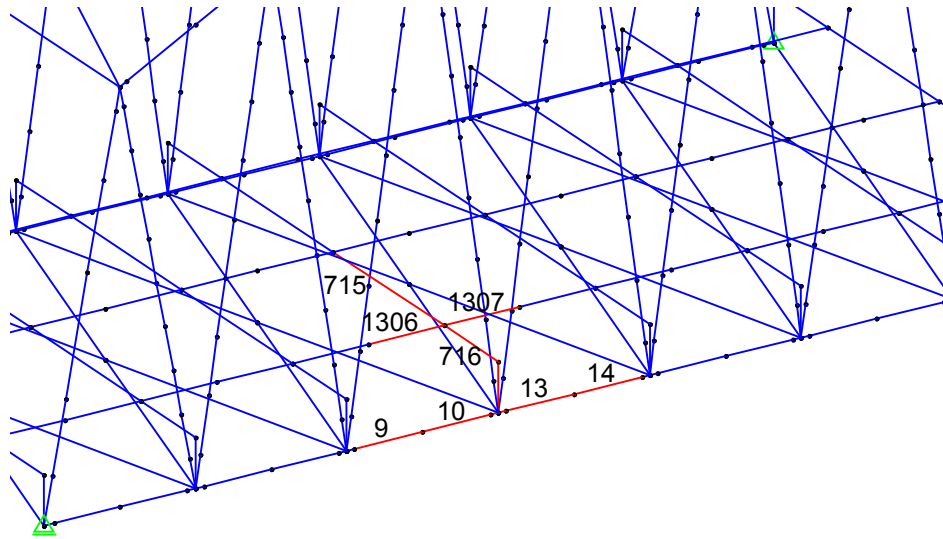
Elements of girder near to the damaged D5u diagonal member
